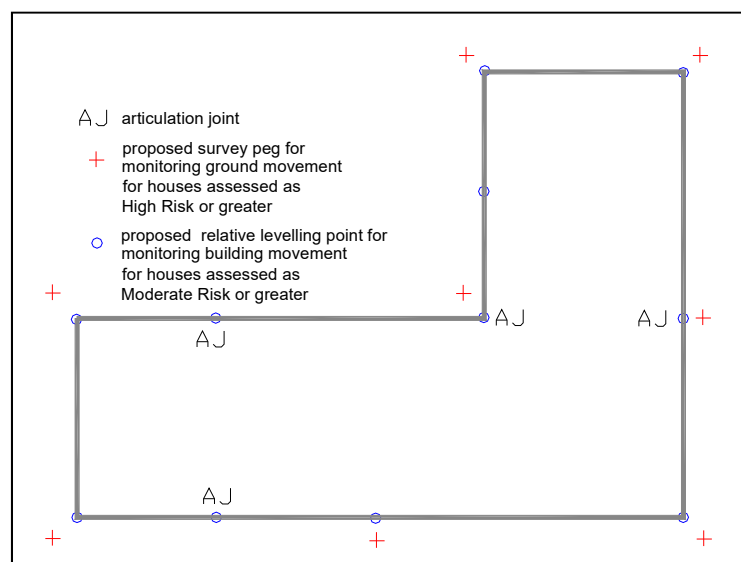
Schematic layout for ground movement and building level surveys around a typical building
